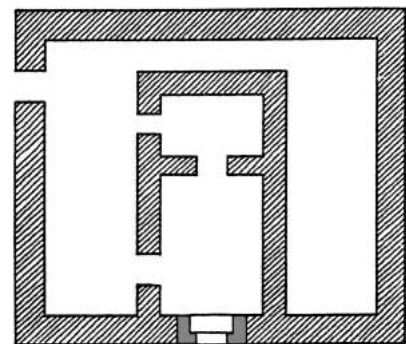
Site 03: Plan of the 'chapel' (after Winlock 1936: Pl. XIII).
